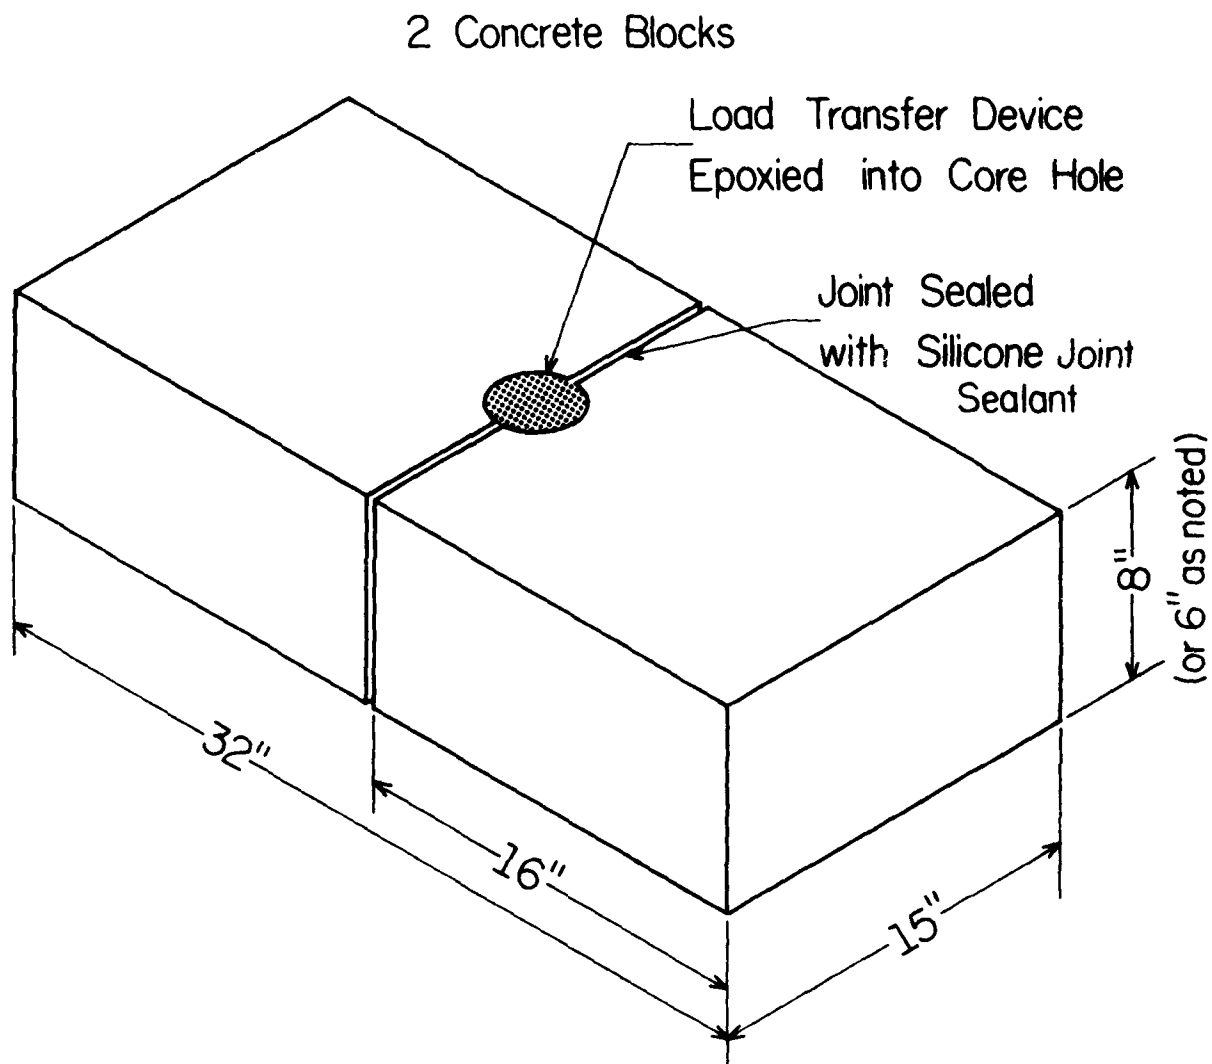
Concrete Block Test Specimens Used to Evaluate Load Transfer Devices in Laboratory. (Same Type of Block Used for All Types of Tests)
